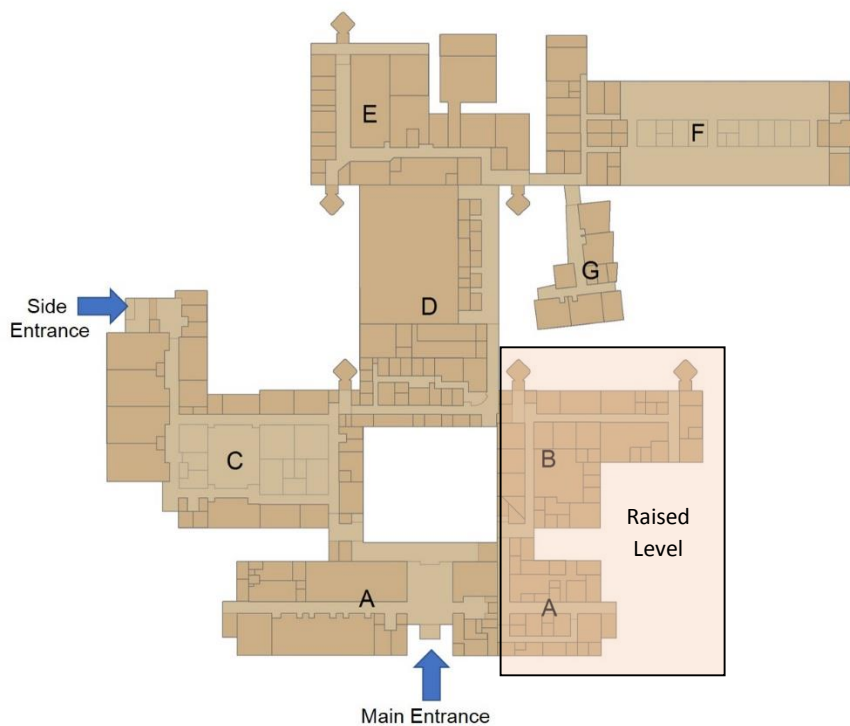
Delaware Technical Community College, Stanton Campus first floor layout
